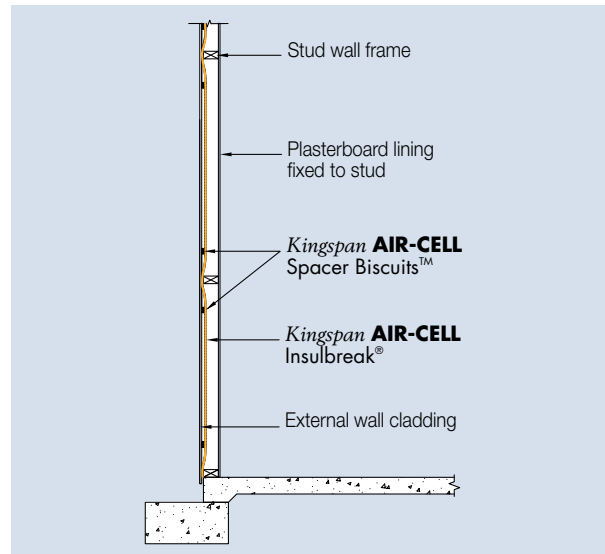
Side elevation of Kingspan AIR-CELL Insulbreak® on steel-framed wall
